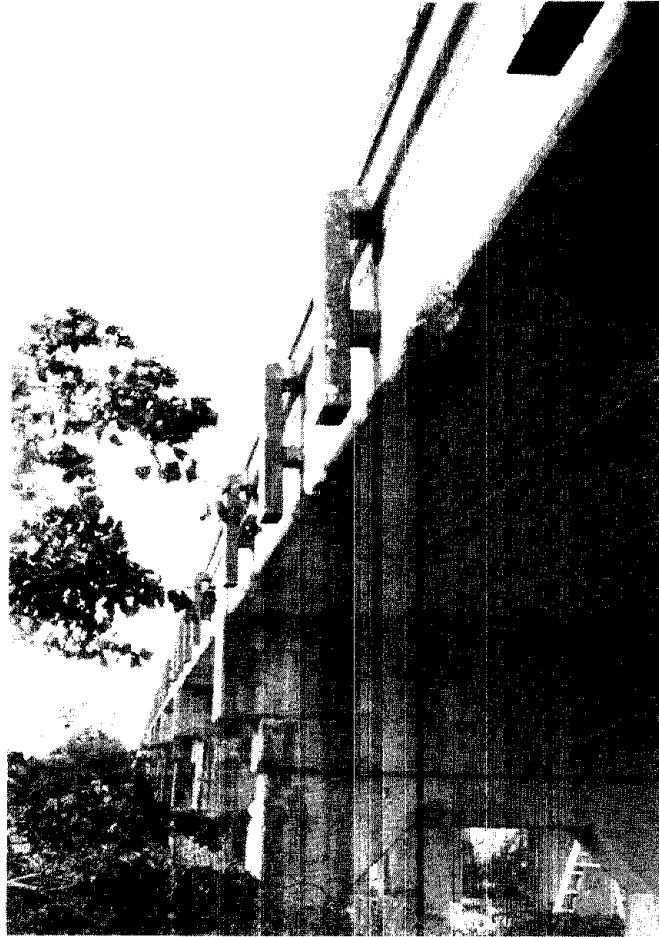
Corrosion related spalling of concrete cover due to water running along the side of a girder.
